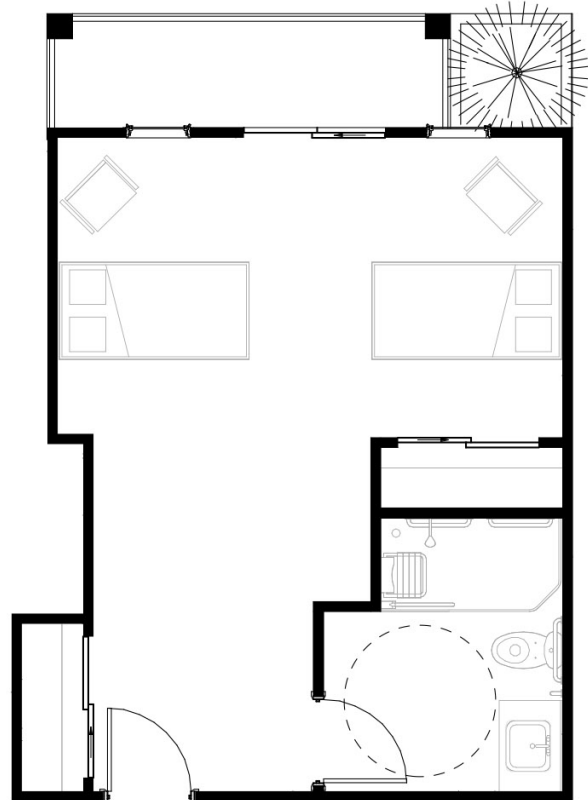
Unit Type 2 Floor Plan | Scale: 1:75.
